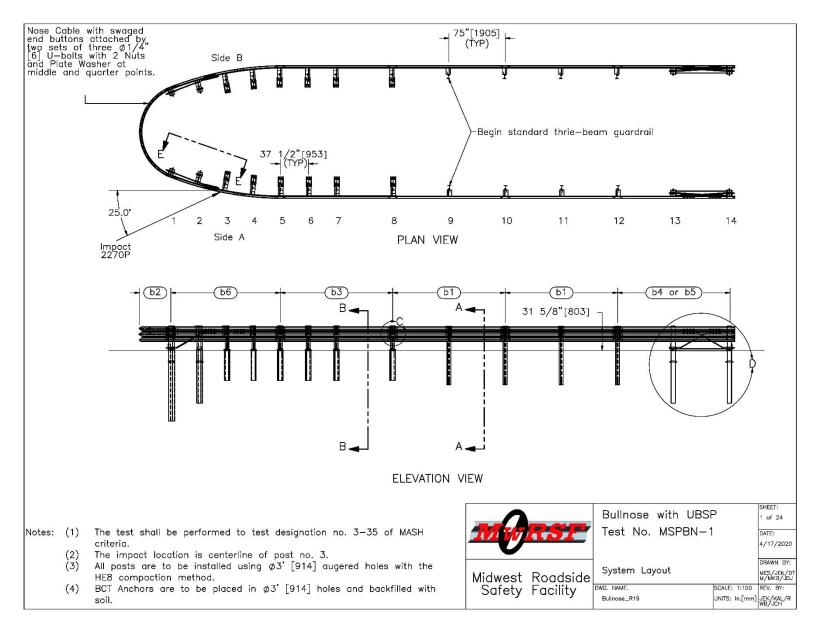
Test Installation Layout, Test Nos. MSPBN-1
